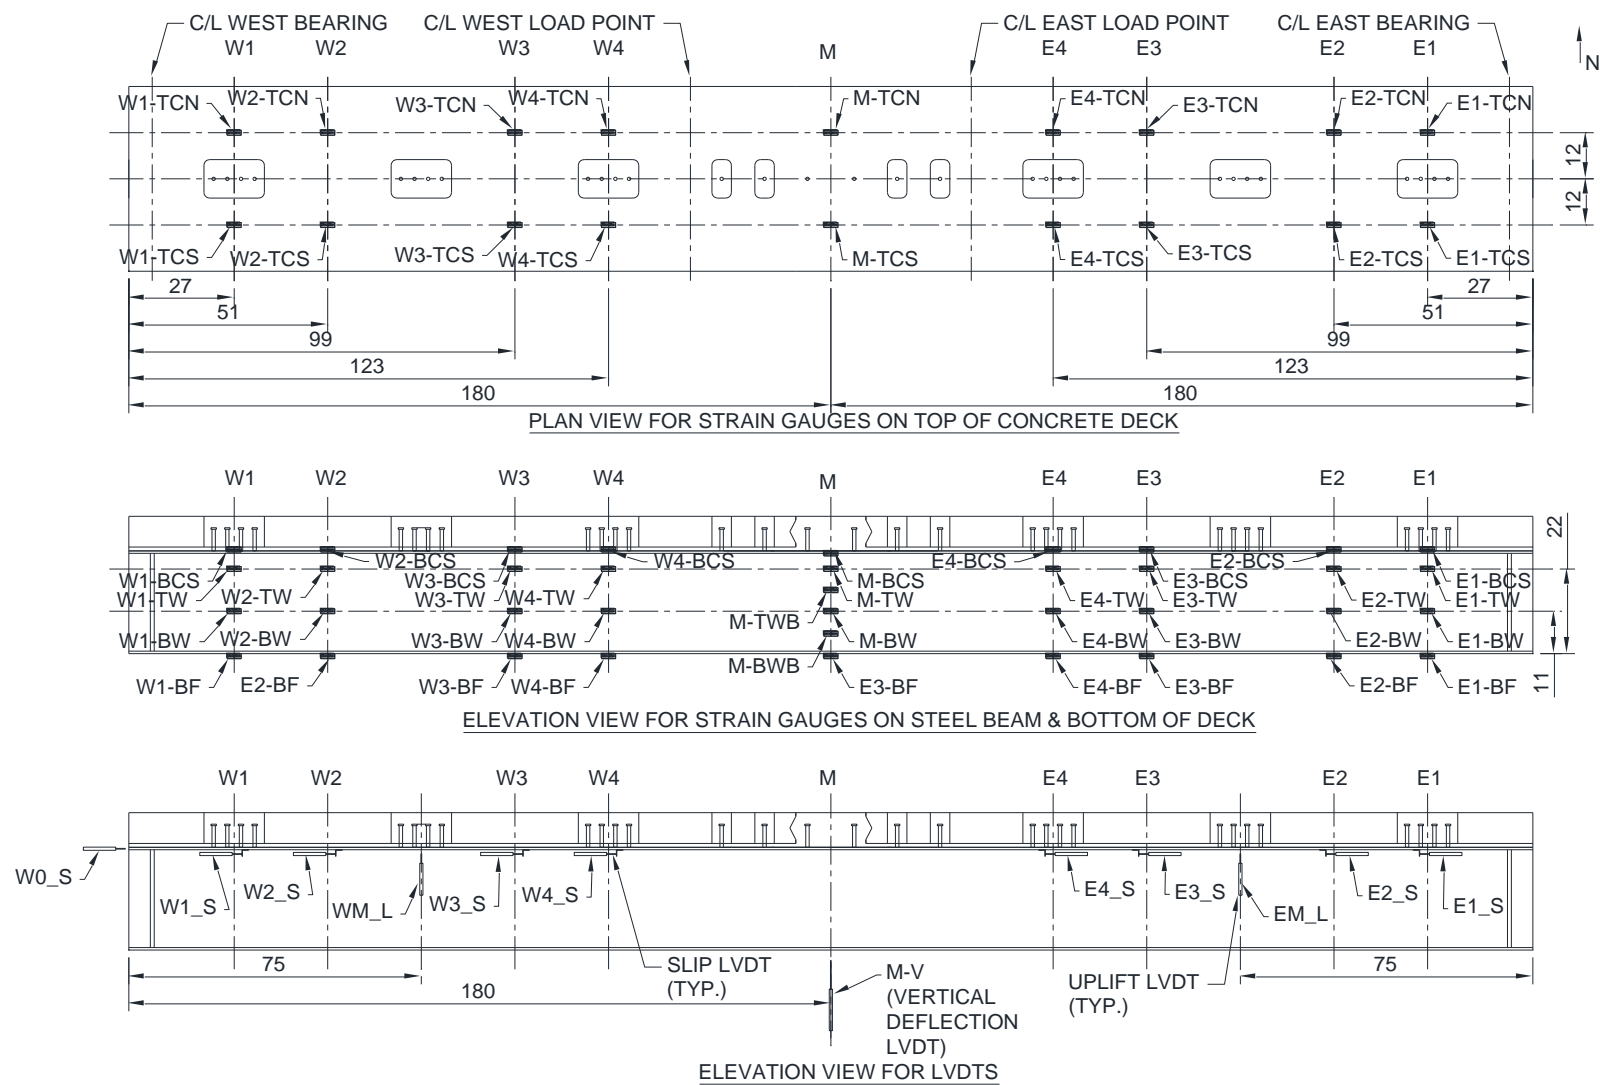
Schematic. Plan and elevation views for instrumentation on a large-scale specimen with 24-inch shear stud spacing.
